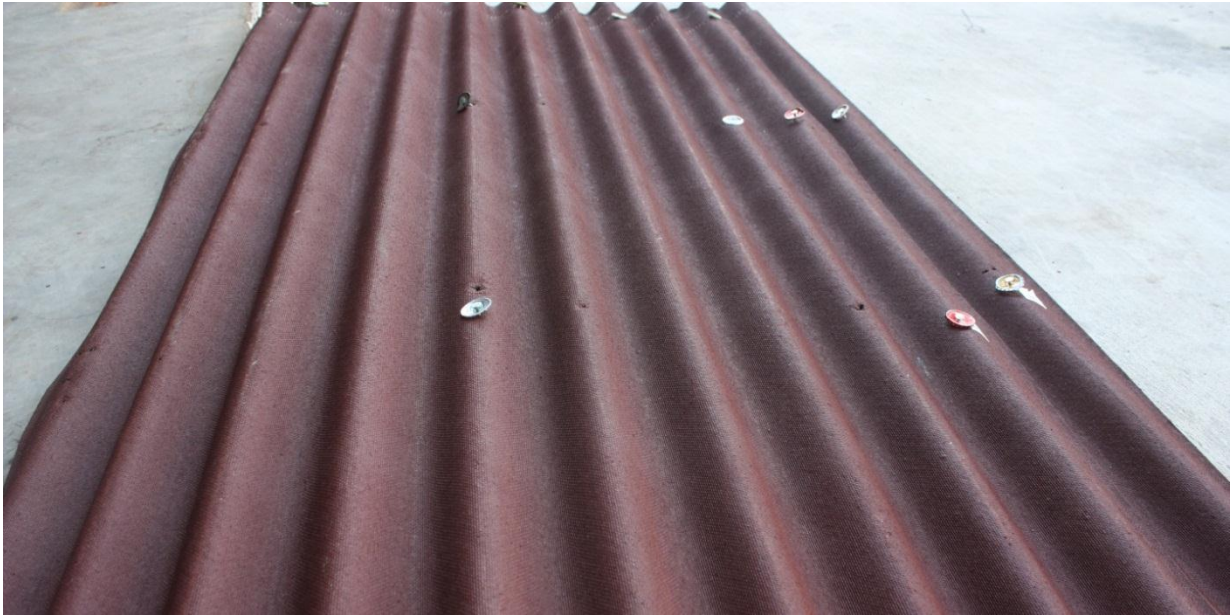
CFBF sheet detached from roof supporting structure, seen here with roofing nails and bottle caps still attached
